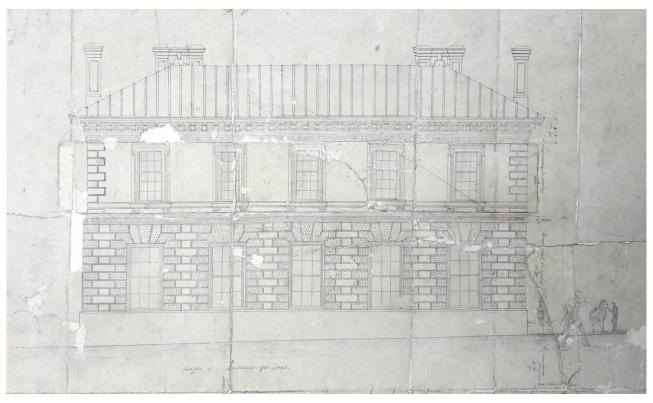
Elevation of Treasury Building, facing Bridge Street, c. 1850 (not built as drawn - built instead with seven window bays and a door to Bridge Street)
